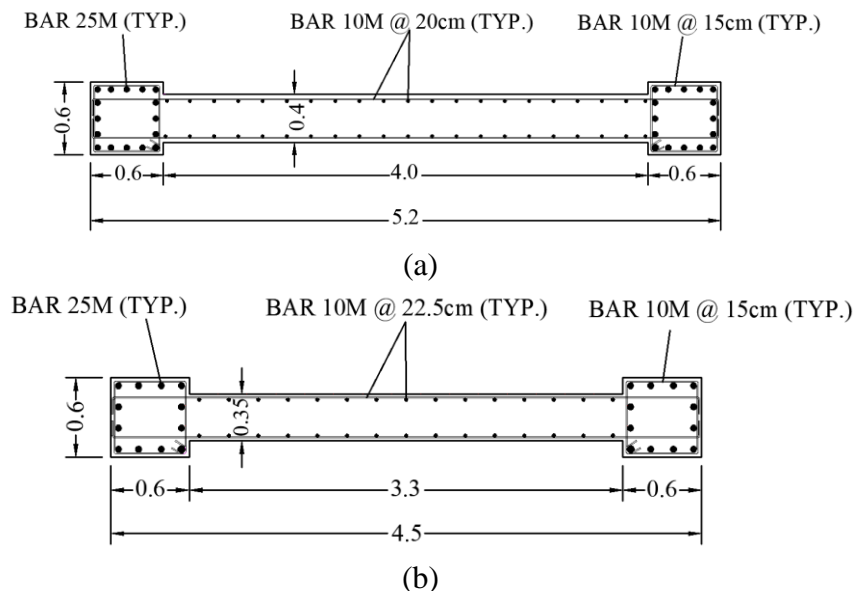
The details of designed shear-walls for modular buildings: (a) 12- storey model; (b) 6-story model
